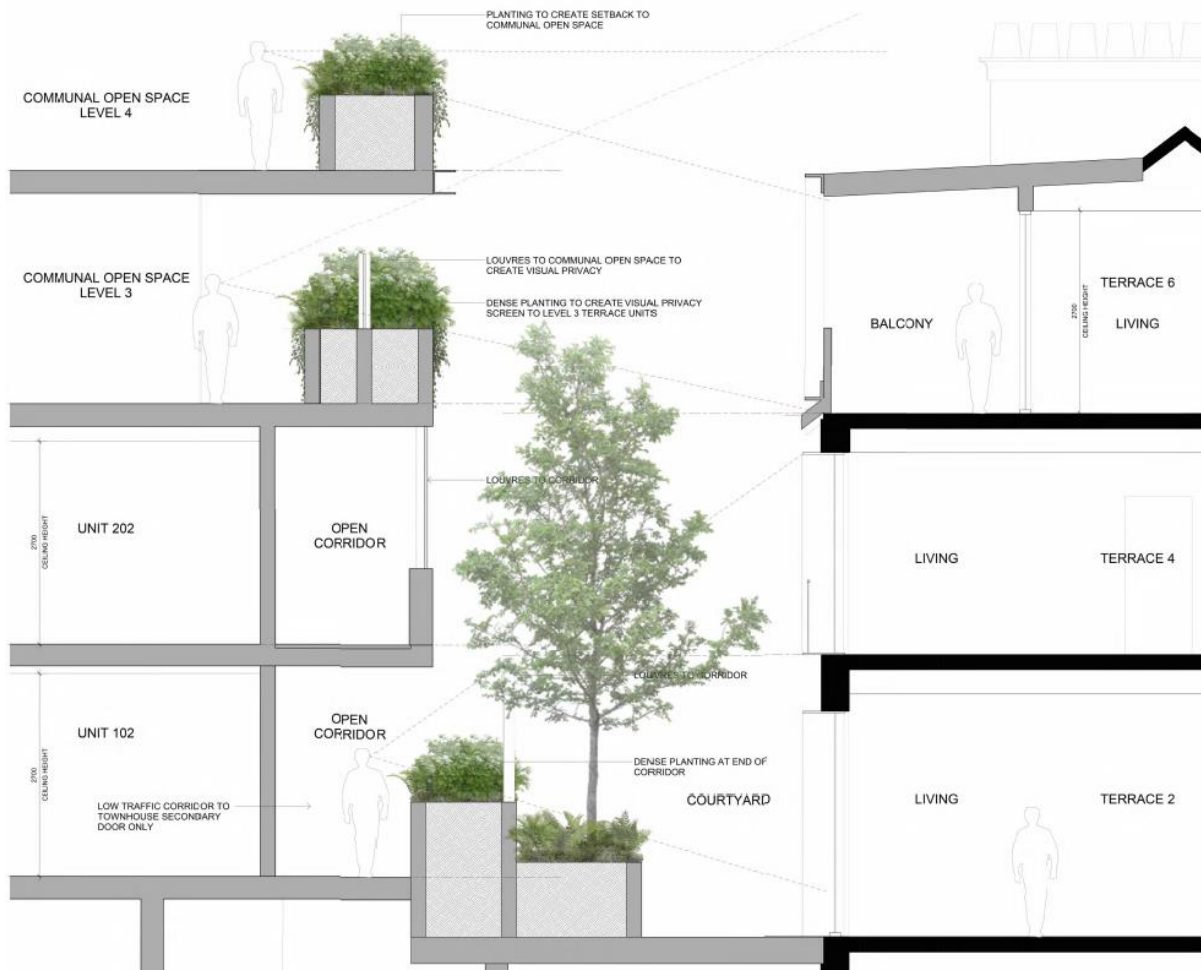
Section plan showing relationship between the proposed communal open space and the proposed terrace apartments
